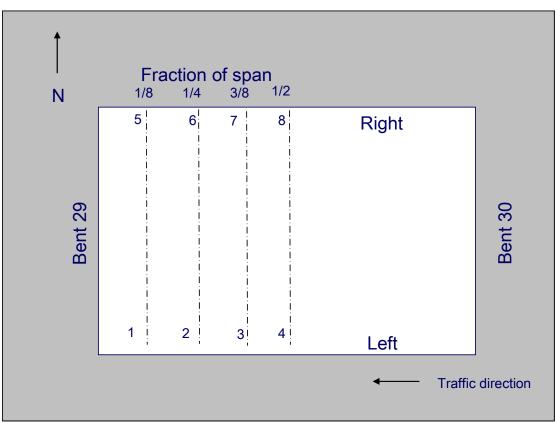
Instrument Location Site 1: Ben White Span 29
